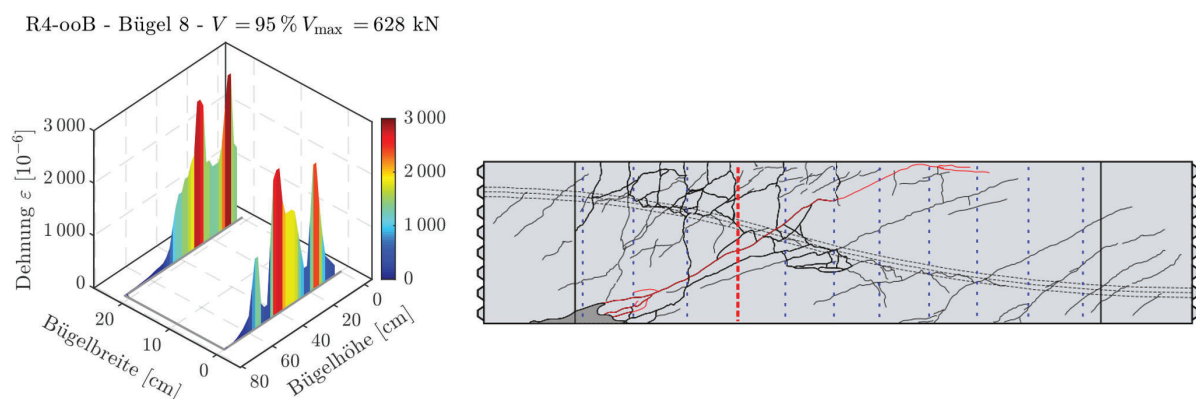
Strain measurement on an open stirrup and location in the beam element [11]
